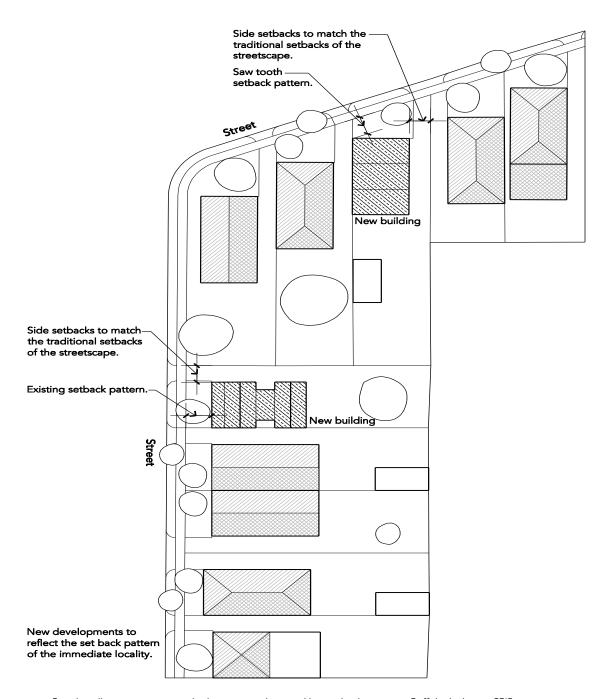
Site plans illustrating existing setback patterns and compatible new developments — Griffiths Architects 2012.
